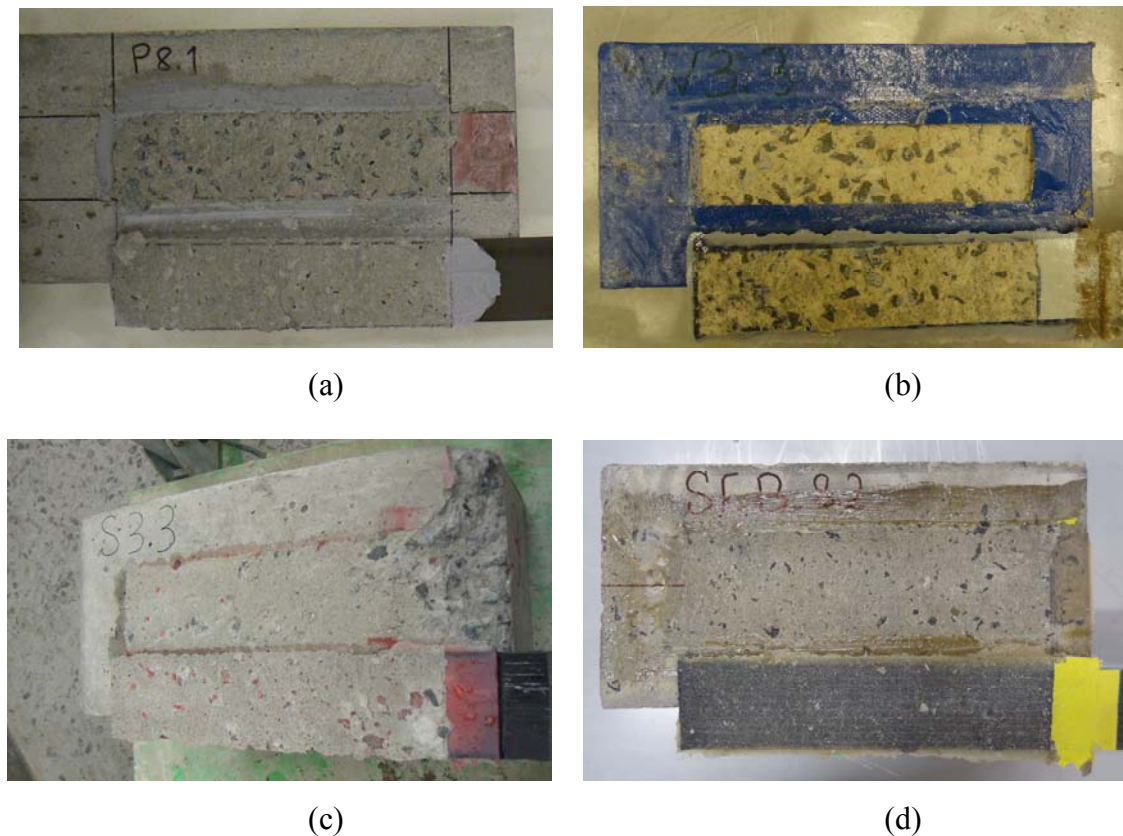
Fractured interface of (a) pultrusion, (b) wet lay-up, (c) HVBO and (d) VARI specimens.
